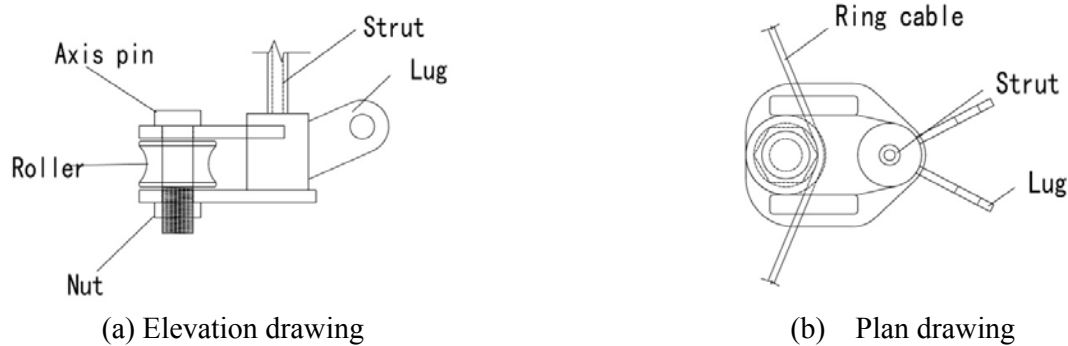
Model Drawing of the Sliding Cable-strut Joint
